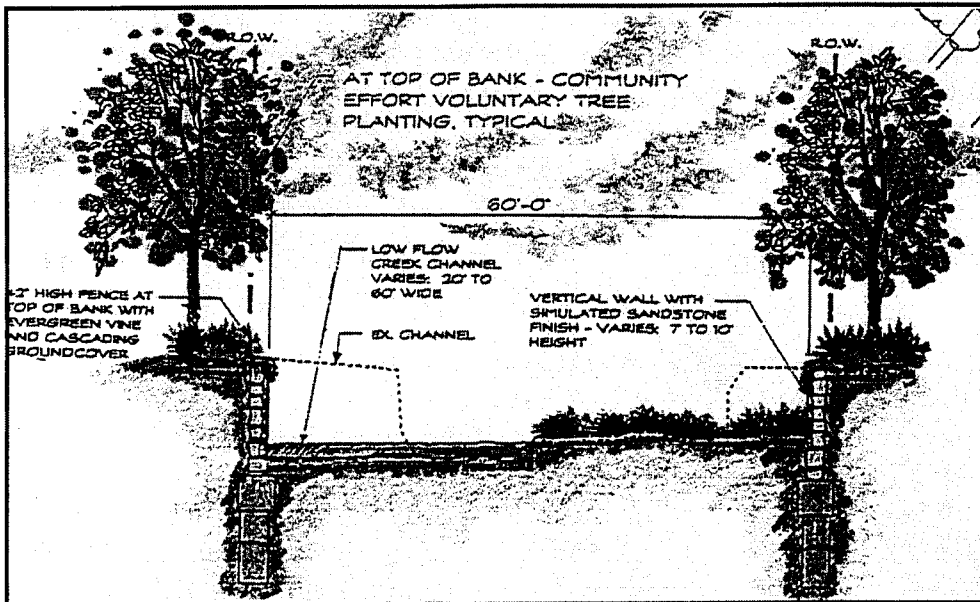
Vertical Wall on Pier Footing Representative Cross Section
